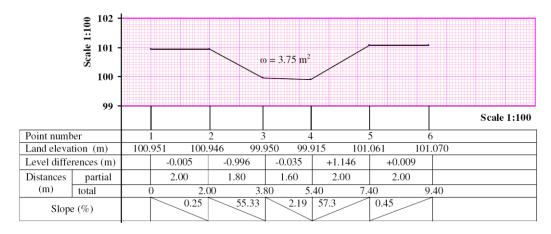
Transversal section through the CC<sub>1</sub> canal, downstream, nearby the clogged culvert
